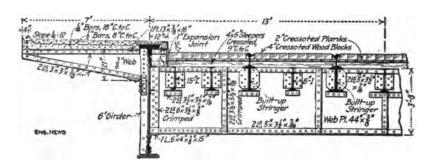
Roadway Congress St. Bridge, Chicago, Ill.
